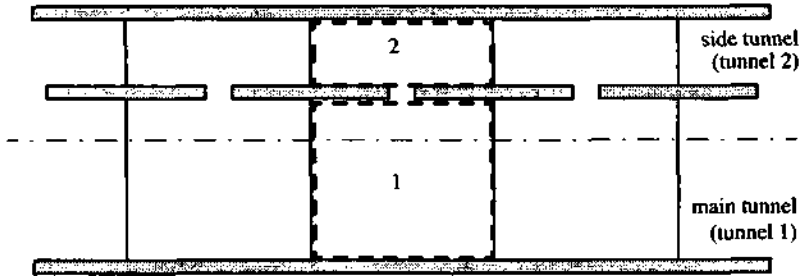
Vertical cross-cut of a tunnel with perforated wall on top, sideview
